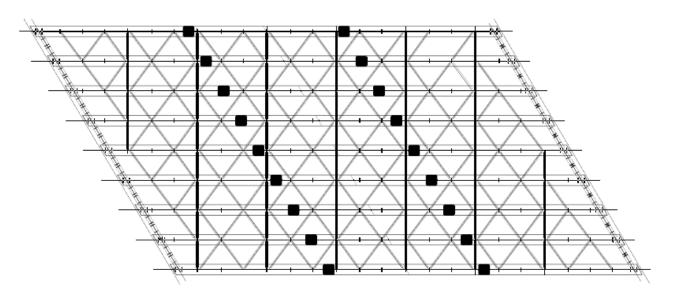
Bottom plan view of the Girder showing vertical and horizontal bracing in higher skew angle
